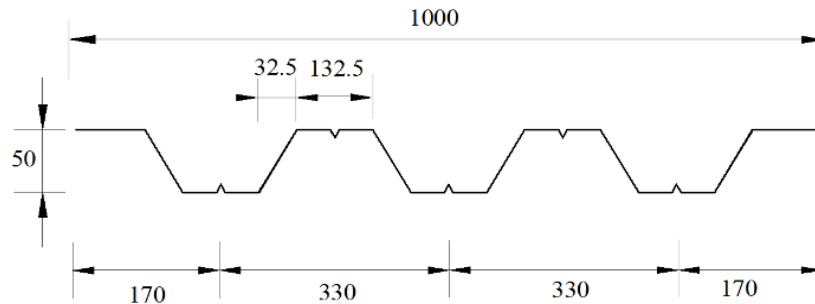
Profiled steel sheeting PEVA 50 (all dimensions in mm)
